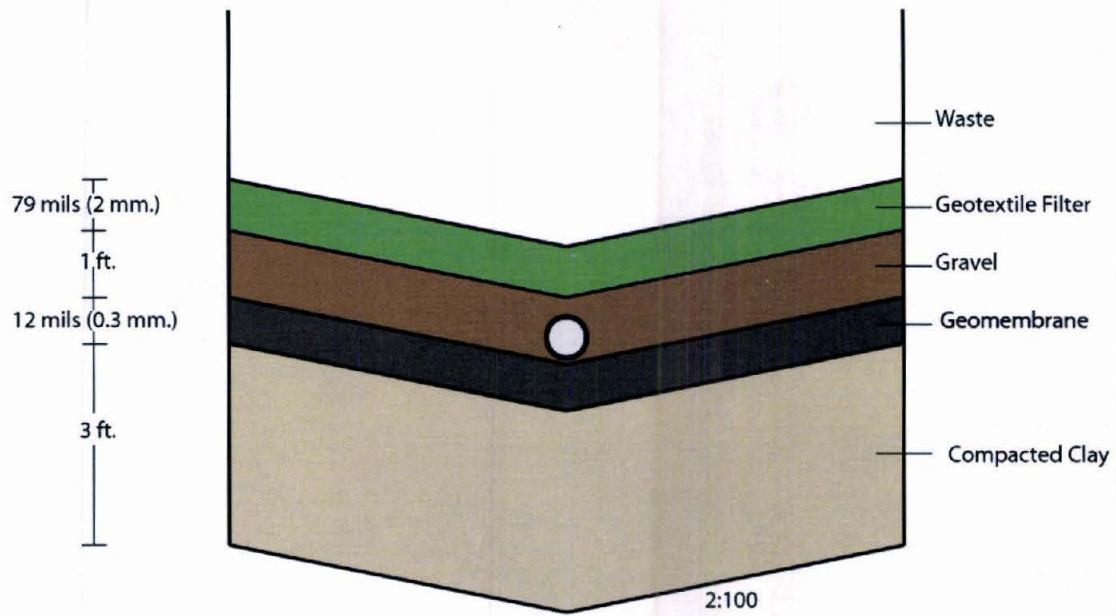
The above illustration depicts the cross-sectional view of the landfill liner and leachate system.
